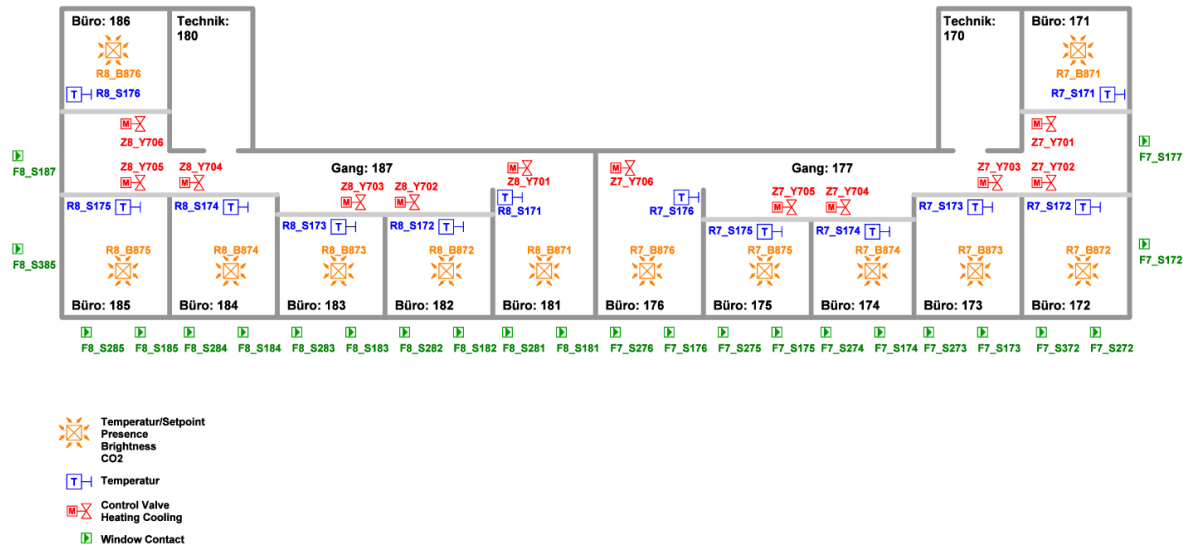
Floor plan NEST Sprint, 1st floor: room layout 171–186, ceiling heating/cooling elements, technical rooms 170 and 180 incl. installed sensors: window contacts, ceiling-mounted multifunction sensor.
